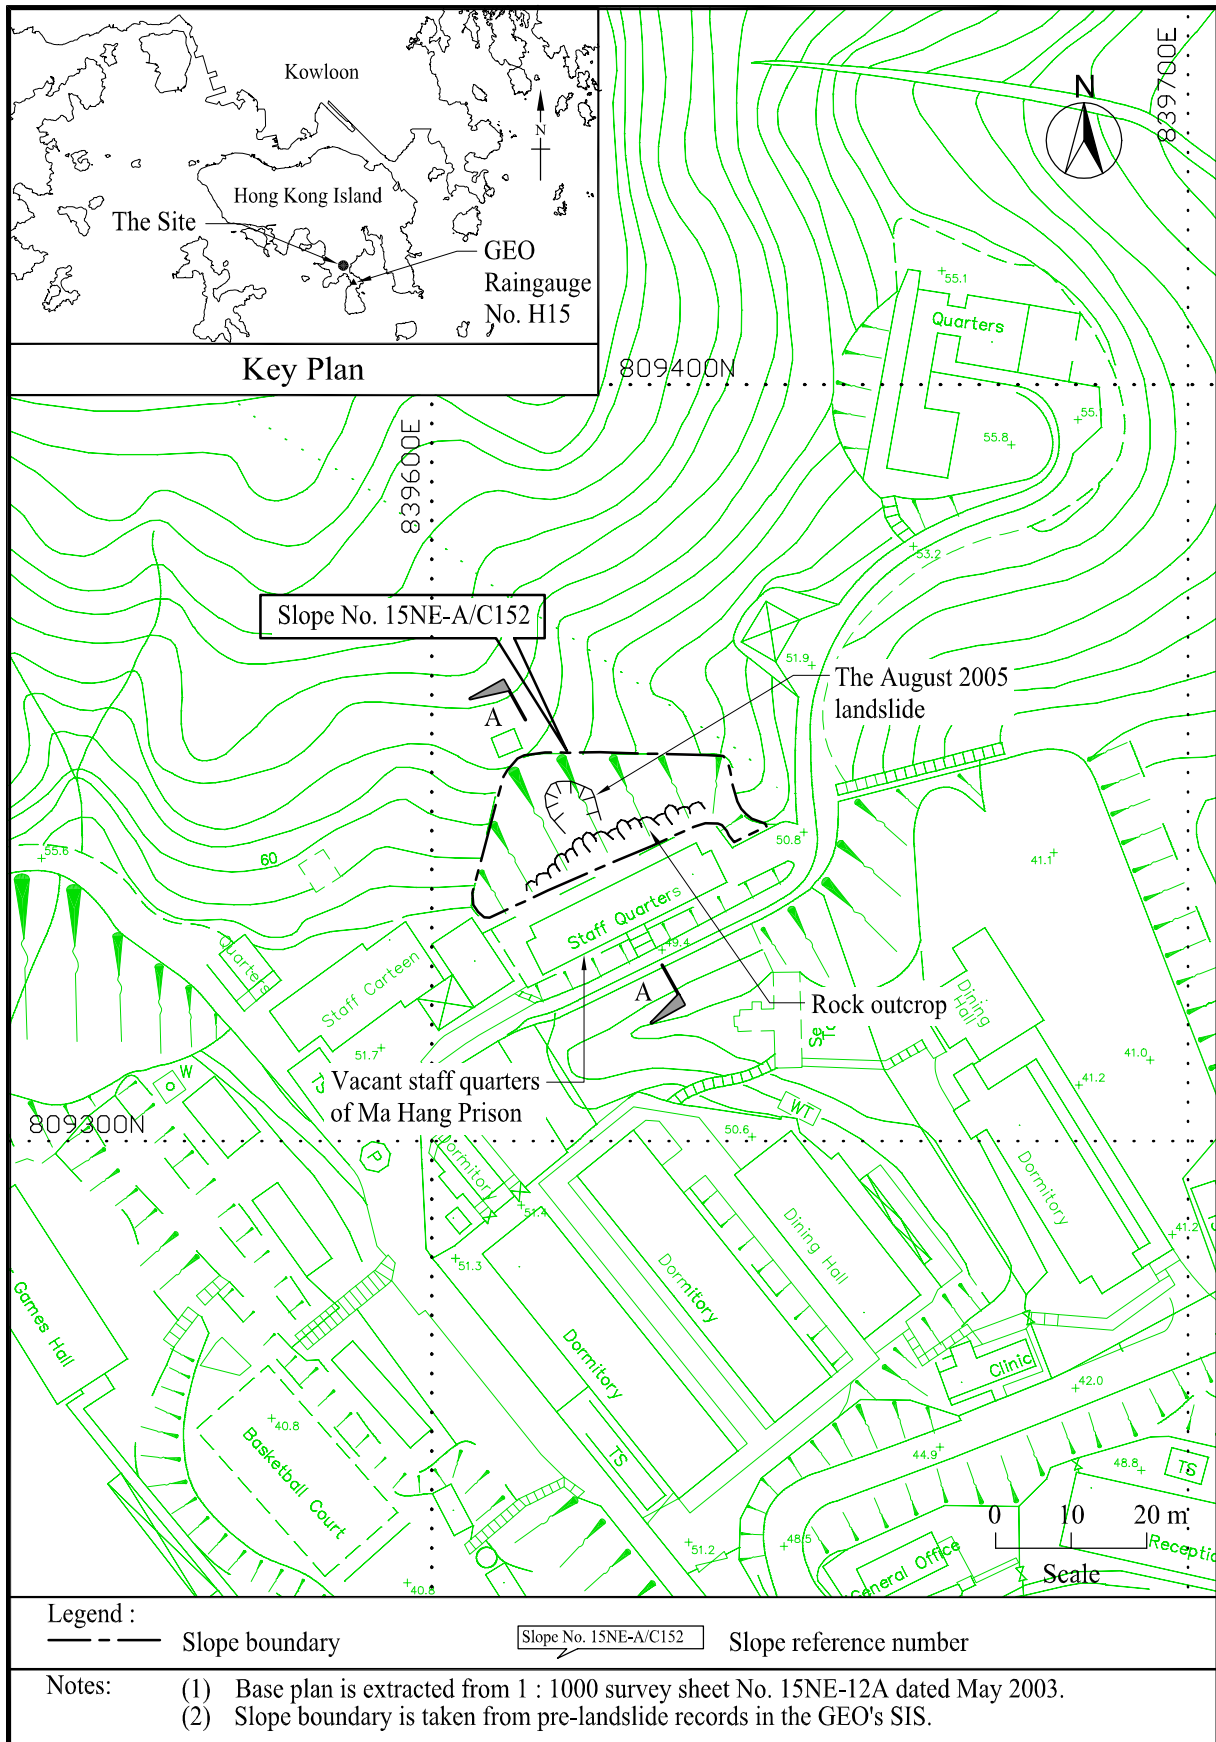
Site Location Plan (Slope No. 15NE-A/C152)
